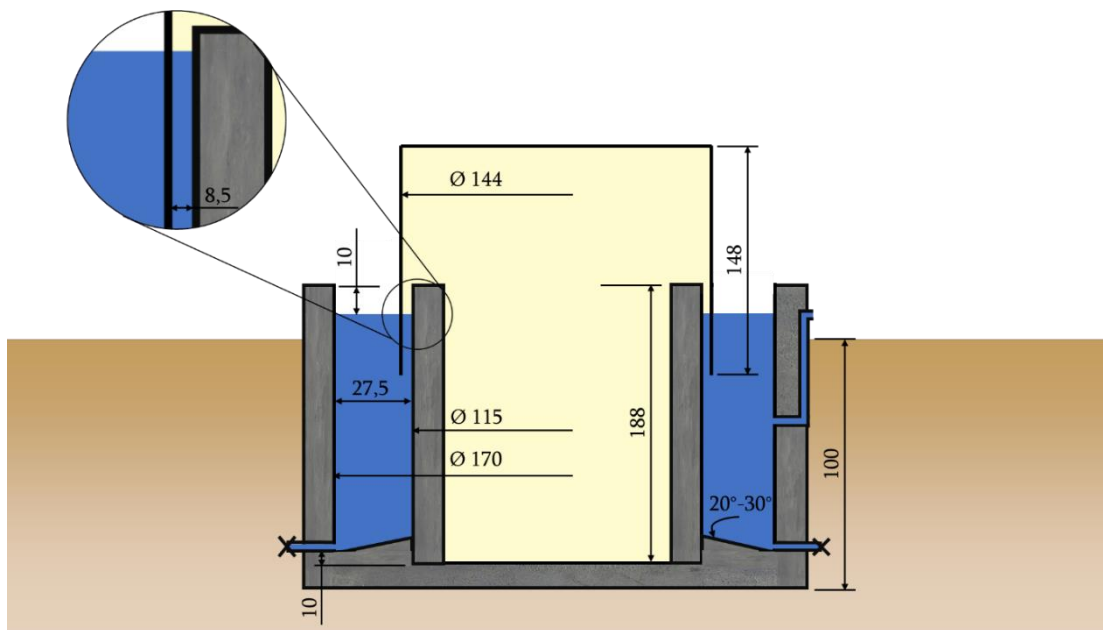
Design of the 2.5 m<sup>3</sup> gasholder (dimensions in cm)
